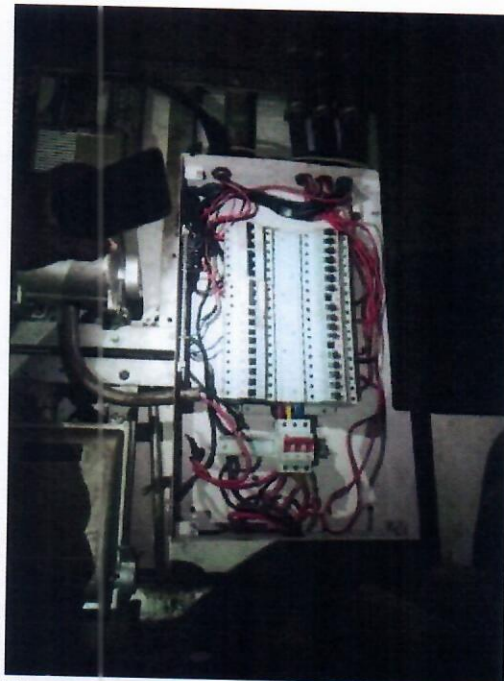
MDB Supplying Power to Consumer's Units on Ground Floor of Main Building
